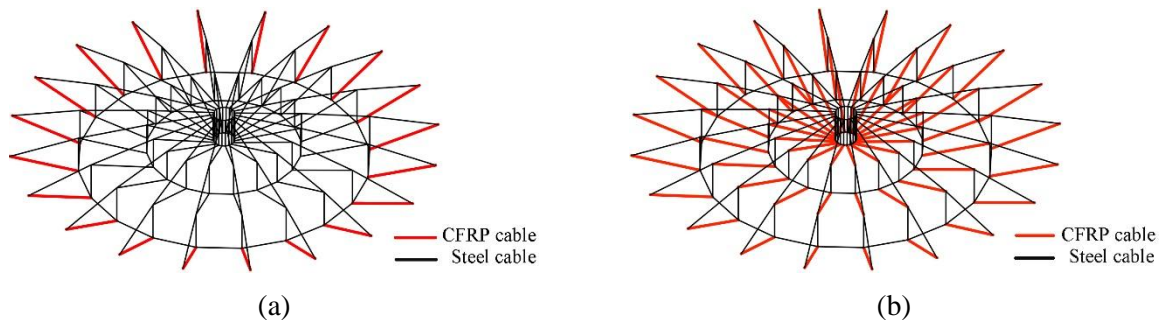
Arrangement of CFRP diagonal cables: (a) outer diagonal cables; (b) all the diagonal cables.
